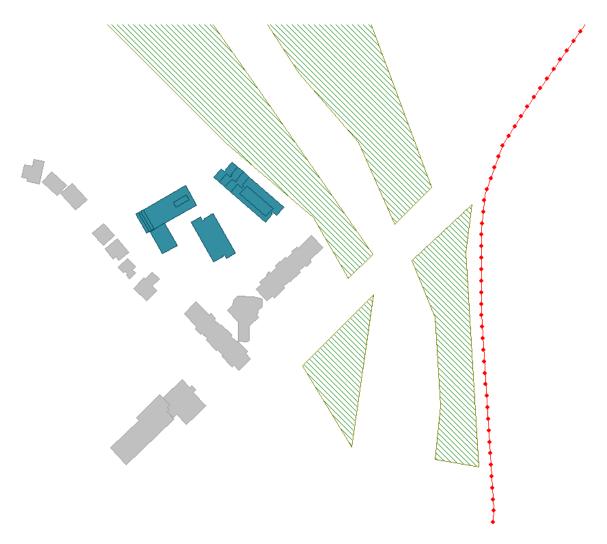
LRT SITE PLAN AND SURROUNDINGS
